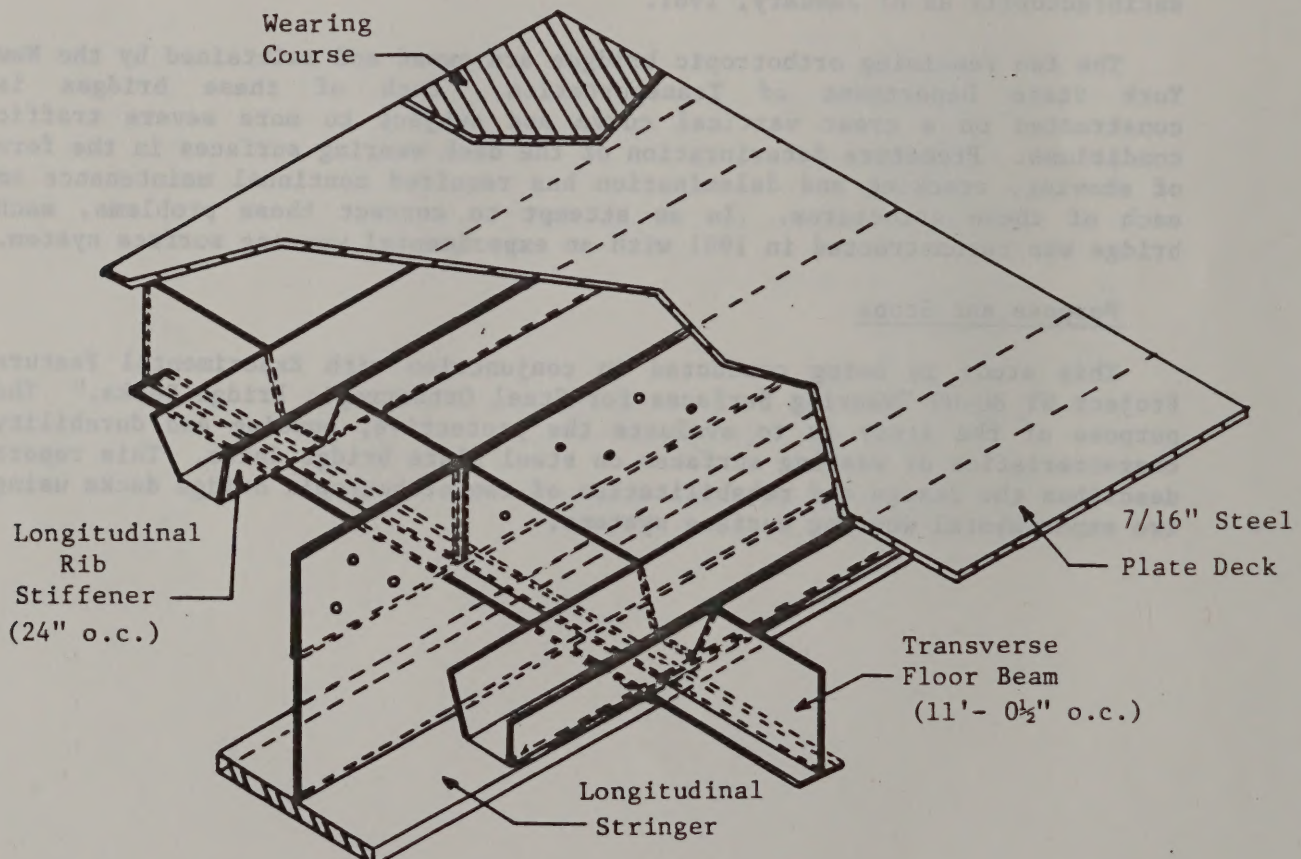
ORTHOTROPIC STEEL DECK PLATE DESIGN
